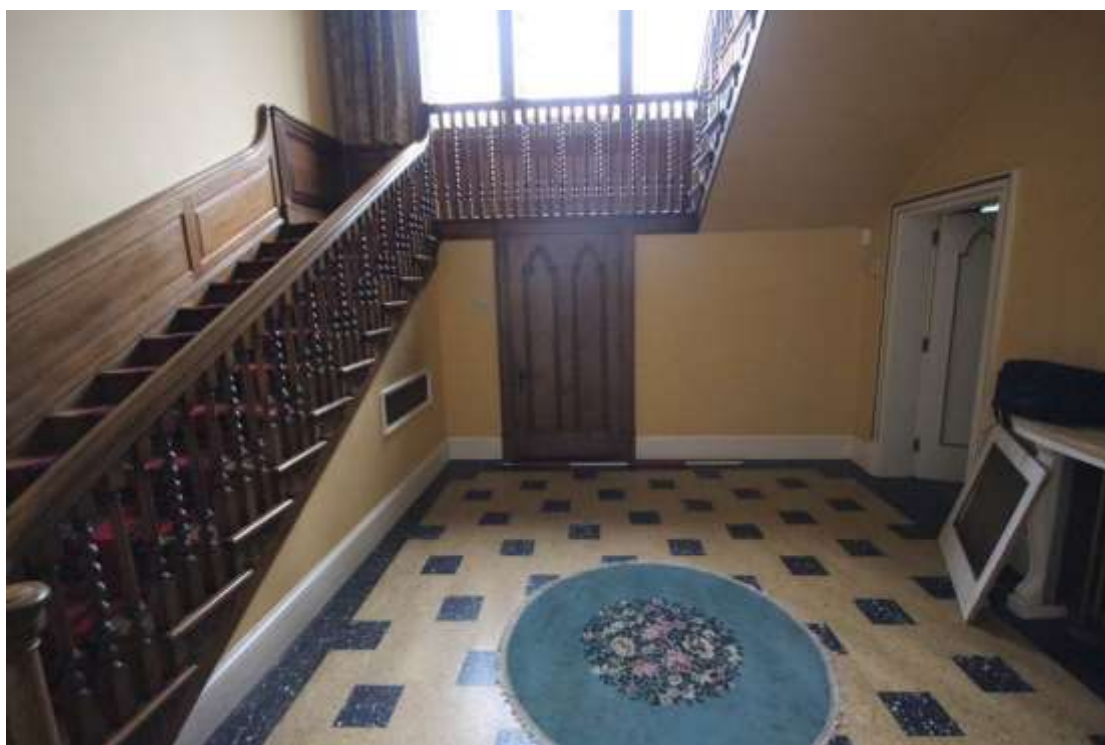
View of the western elevation of the Reception Hall in Block B, facing west. Scale 2m.
